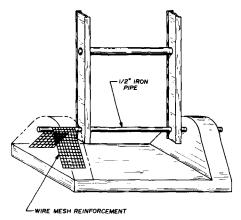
Hinged tilt-over base is made from reinforced concrete.
